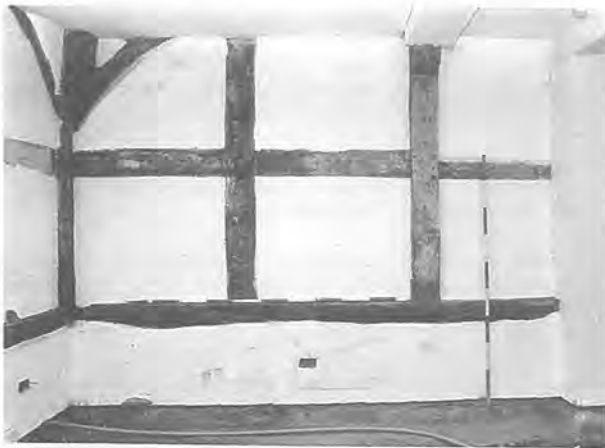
29 High Street: Elevation of East Bay: Ground Floor.
